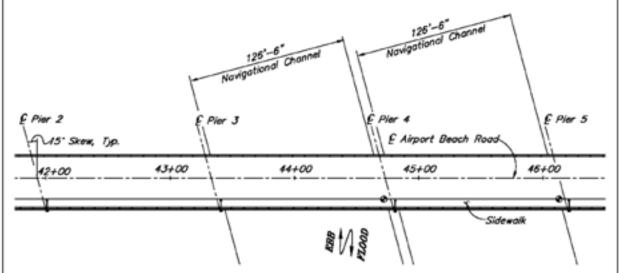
Bridge plan view indicating multiple navigation channel width dimensions to substructure units in the waterway. (Source: Alaska DOT)
